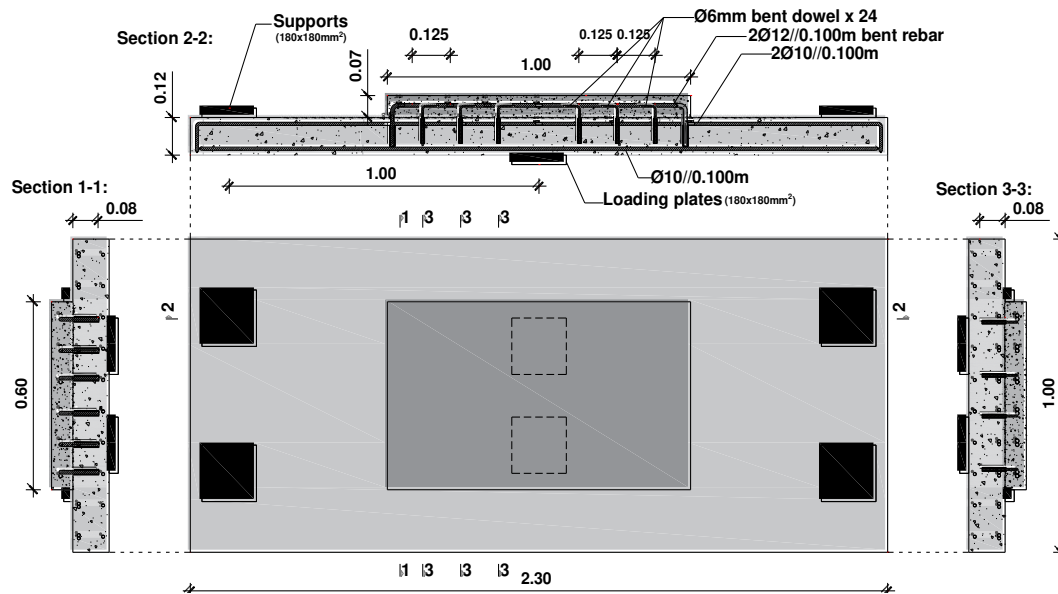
Rebar detailing and strain gauge placing for R<sub>S</sub>-STANC specimens.
